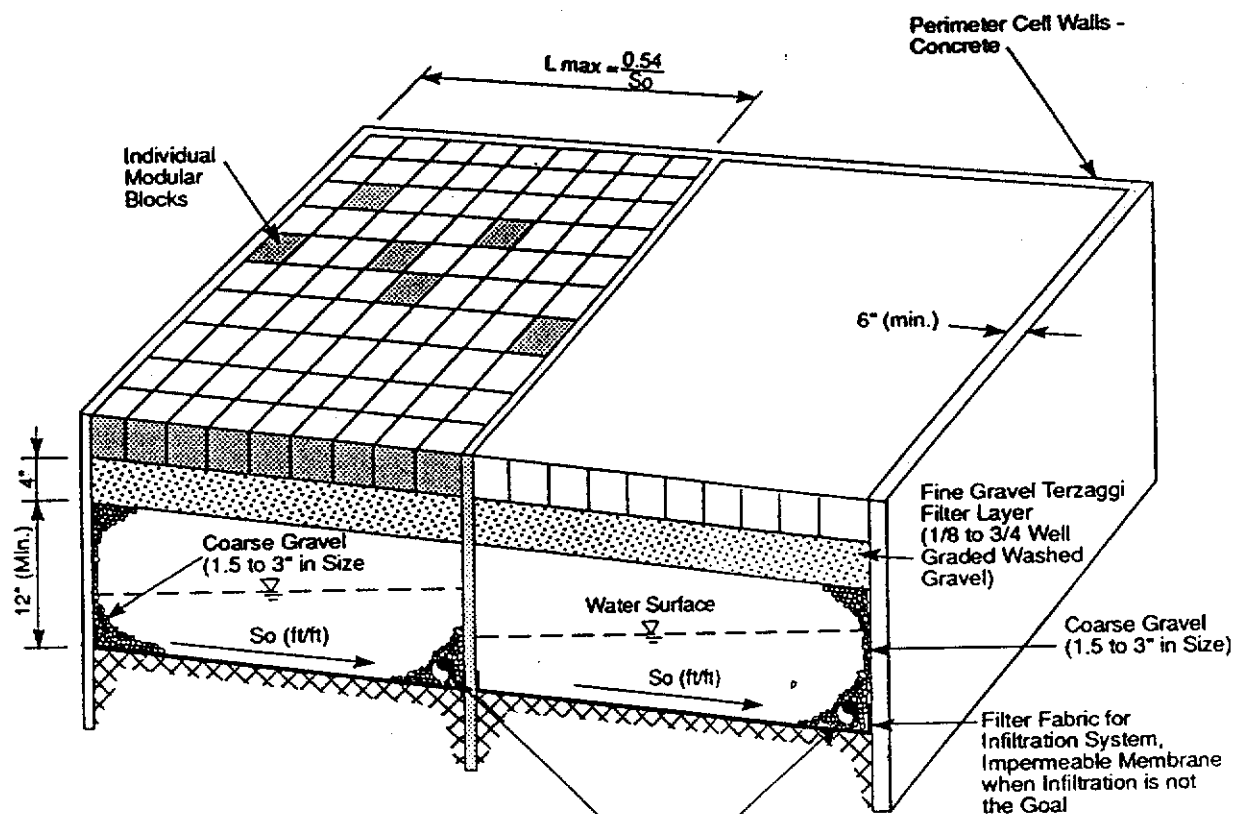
B. CONCEPTUAL PLAN OF JOLLYVILLE FILTRATION, CROSS-SECTION
